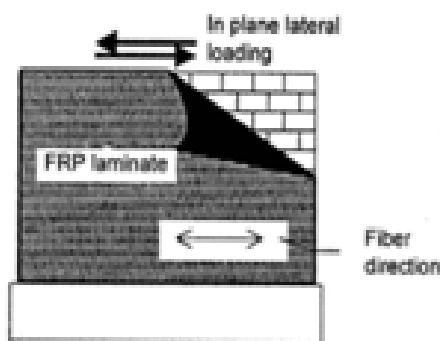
Reinforcement with FRP laminates for lateral loading of wall
